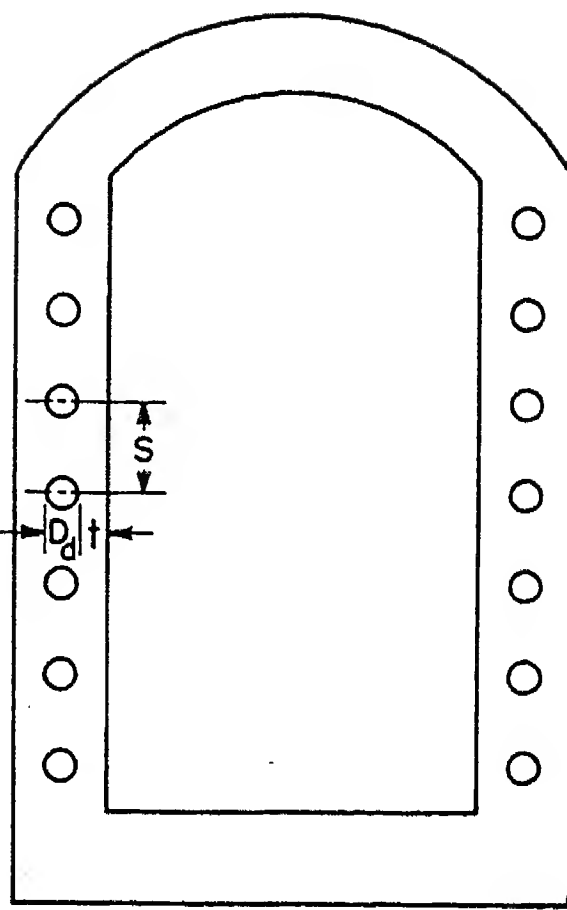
(right). Cable tunnel—cables installed in ducts in the tunnel wall
